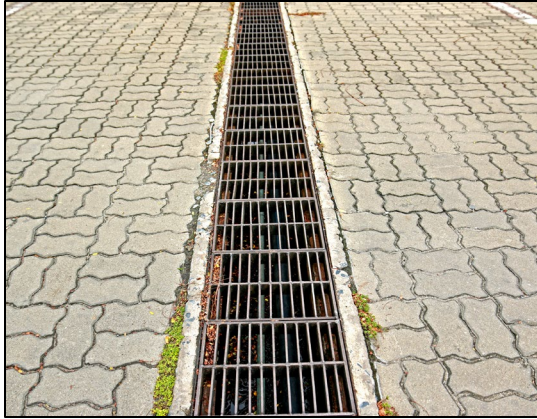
Trench Drain. A trench drain can be used to convey runoff to GI facilities.
